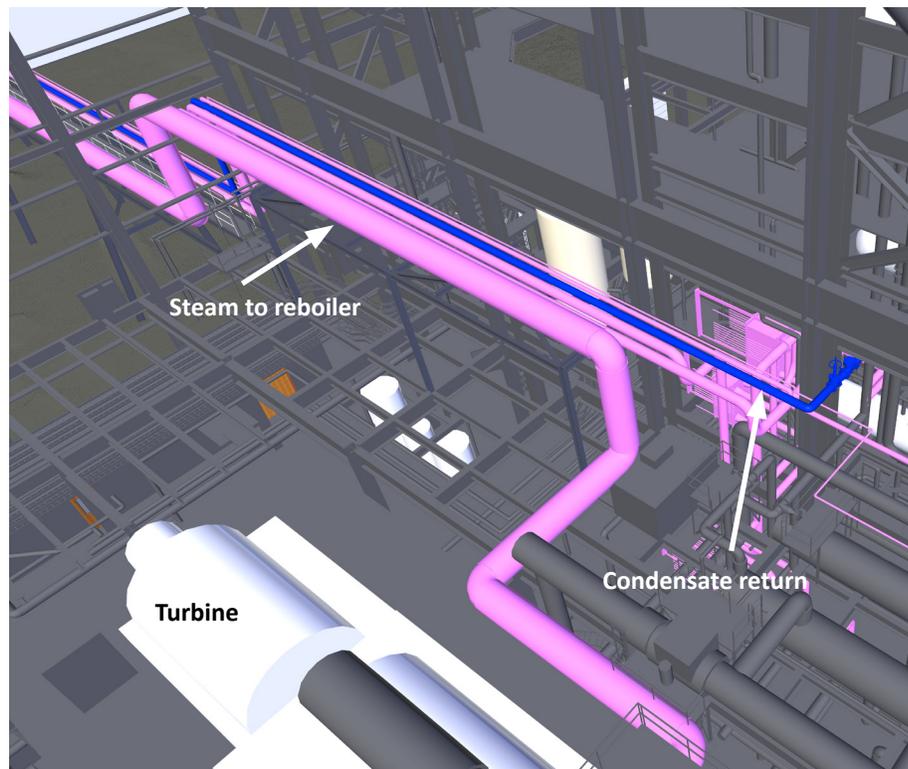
Proposed design and location of condensate return line (highlighted in blue with the north wall of the powerhouse hidden)
